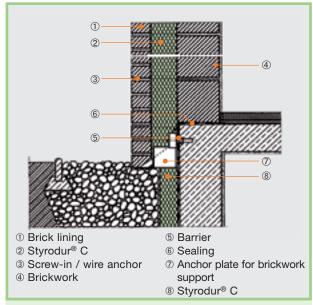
Perimeter insulation connected to brickwork with cavity wall insulation and anchor plate for brickwork support.
